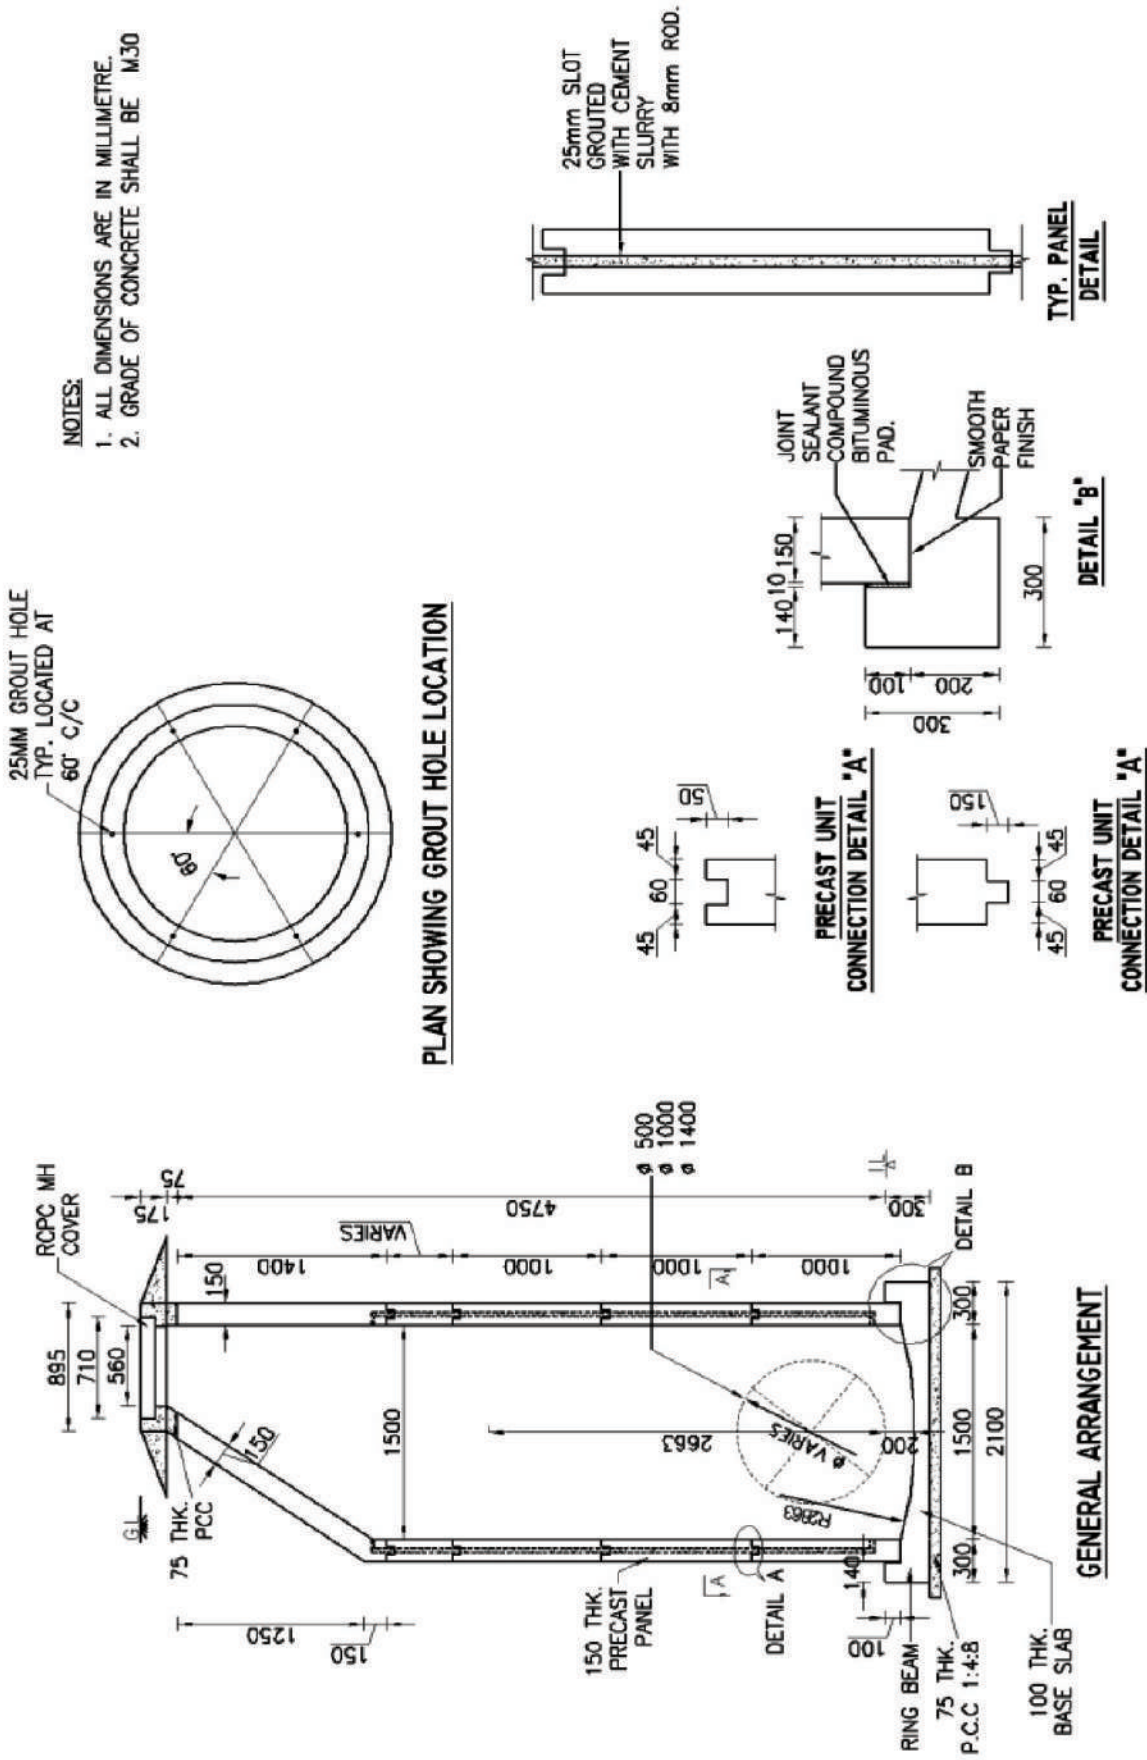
RCC Manhole for a depth between 2.3 m to 5 m
